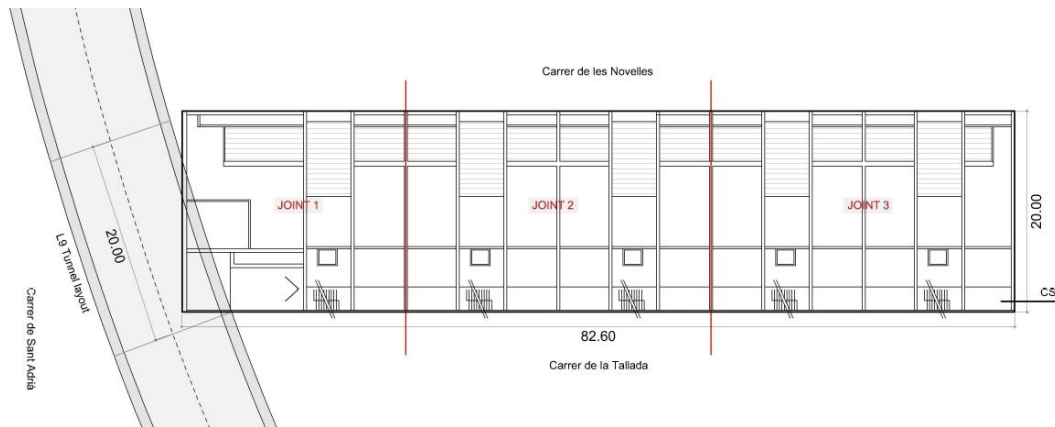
Schematic plan view of L9 tunnel in relation to the building
